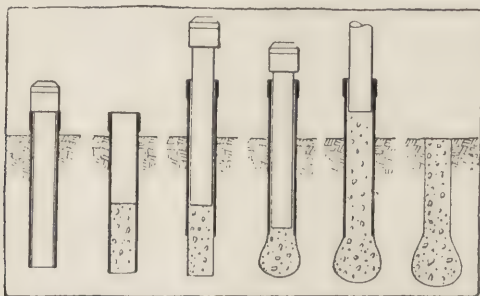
Pedestal Type, MacArthur Concrete Pile.
